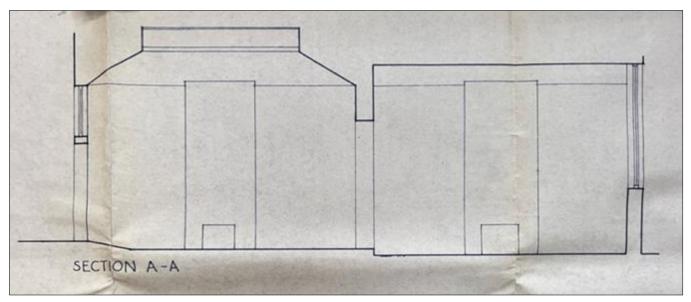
Cross-section of existing coach house (north-south) as per drawing 'Survey of existing buildings' (drawing no 40/4, 1958, by John Burkett ARIBA) (National Archive Ref CRES 35/3545)
